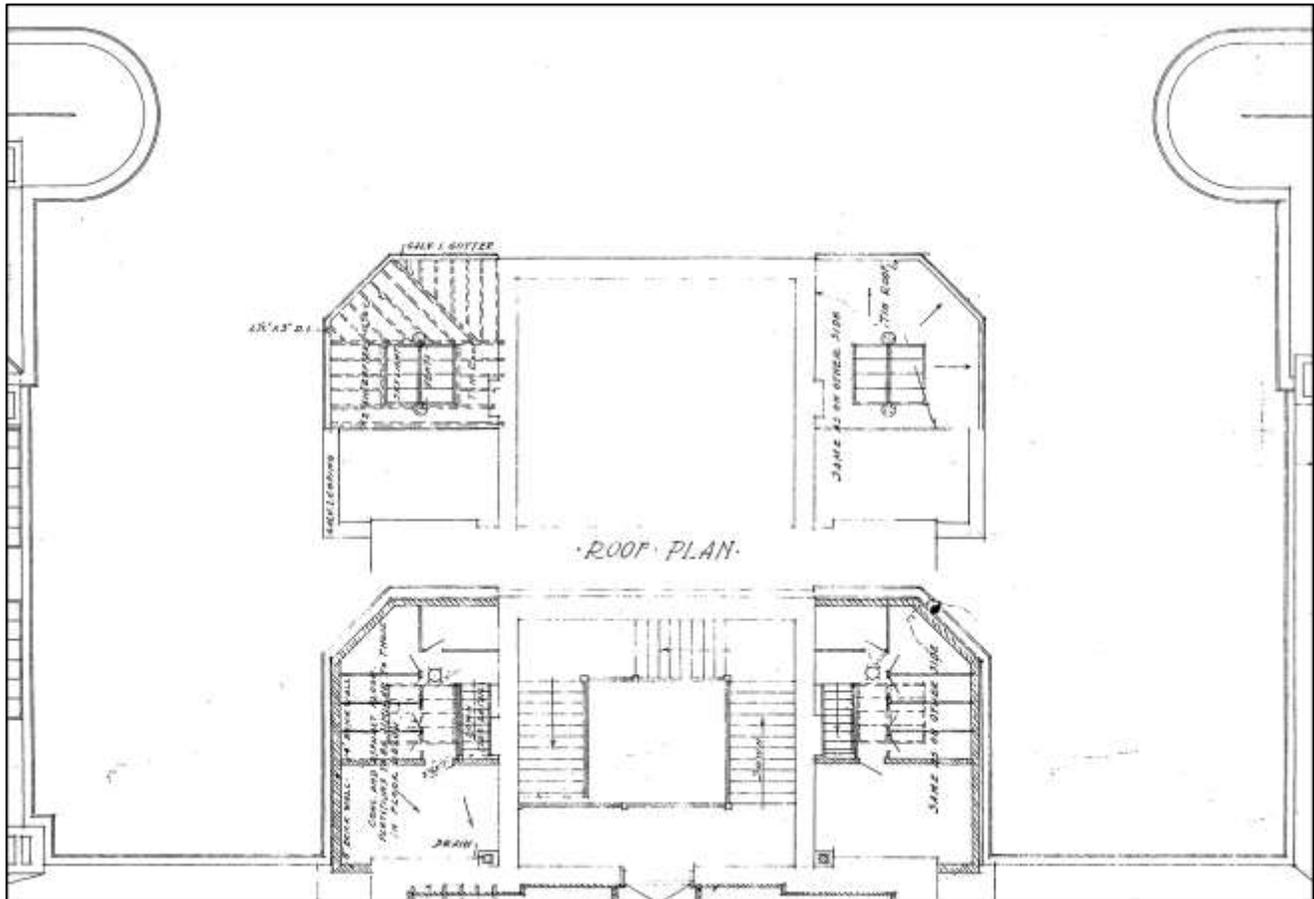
1917 Science Hall renovation plans, fifth floor, showing construction details for the dog rooms. Source: University of Wisconsin-Madison Facilities Planning & Management.
